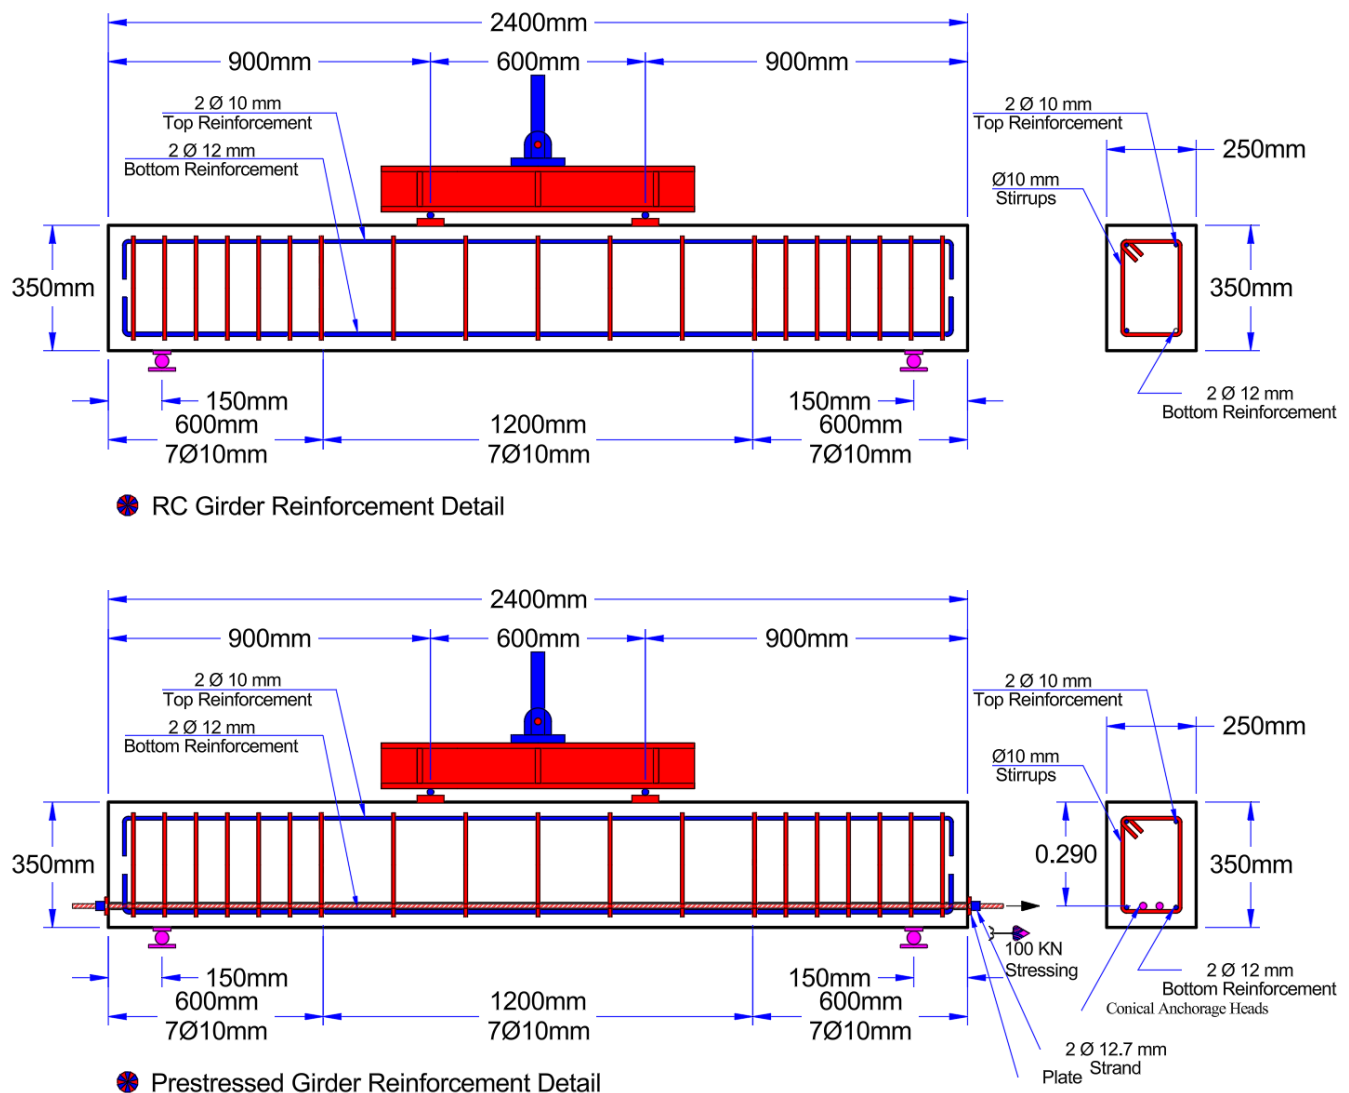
Typical reinforcement and prestressing details of the tested bridge girders. Dimension lines are in blue, casted concrete beam boundary is thick black, roller supports are in purple, loading actuator is blue, steel load spreader beam is in red, main horizontal reinforcement bars are in blue, stirrups are in red, and strand is hatched with red and white strips.
